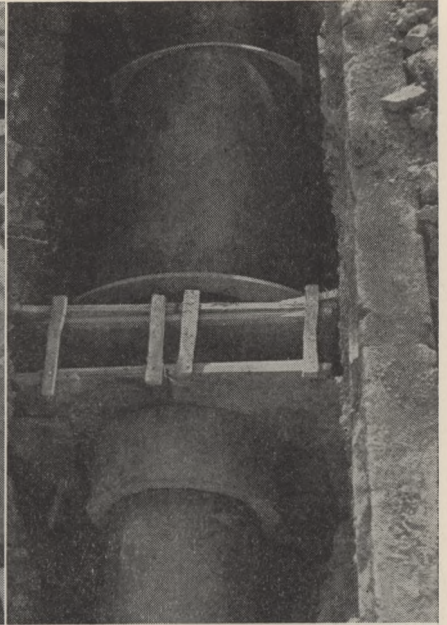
Section of Line at Expansion Joint Showing Anchor, Sheet Metal Arch, and Wooden End Forms.
